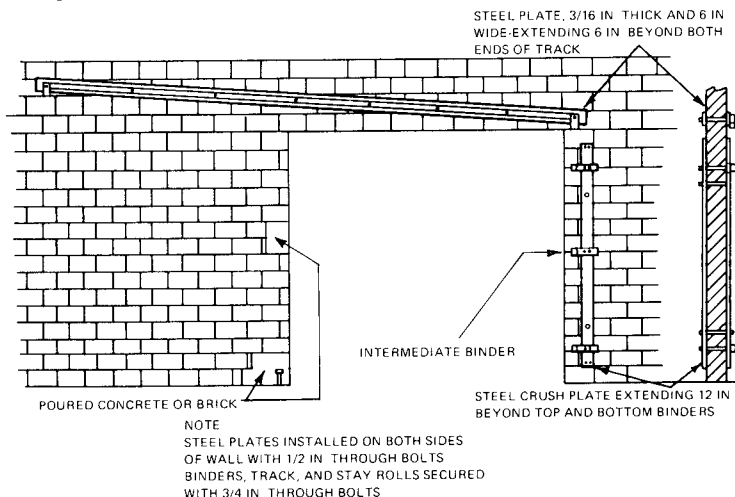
Hollow concrete masonry wall prepared for a single sliding door.
